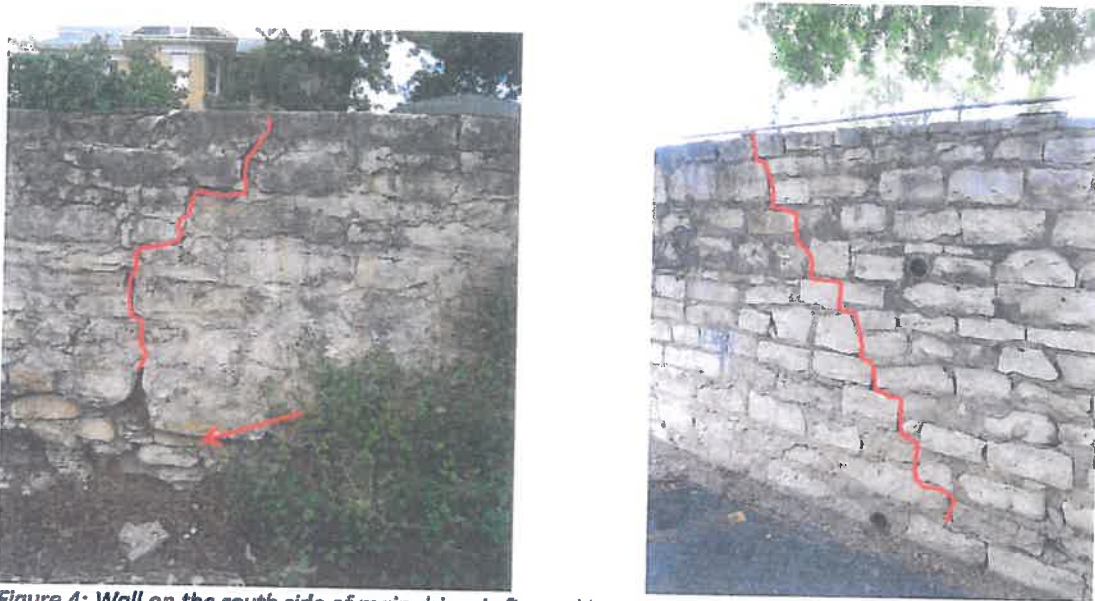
Wall on the south side of main drive; Left, cracking on outside face of wall and outward displacement at the base (highlighted). Right, stair step cracking on the outside face of the wall (highlighted).
